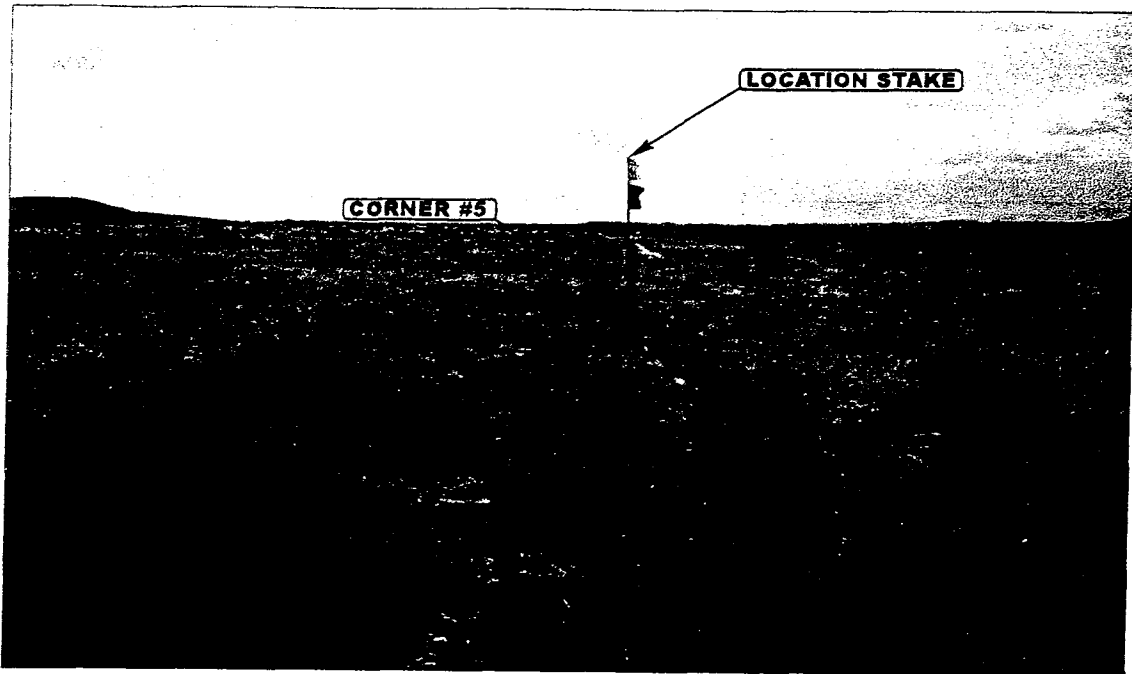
PHOTO: VIEW FROM CORNER #5 TO LOCATION STAKE
